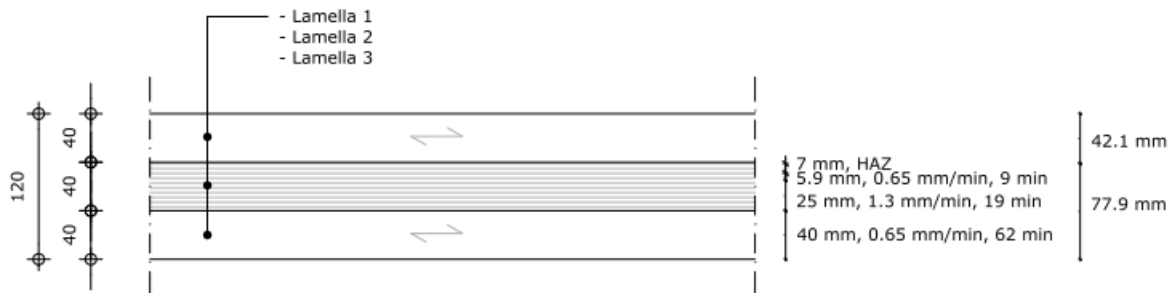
Charring thickness floor design 3 minimum cross-section in mm
